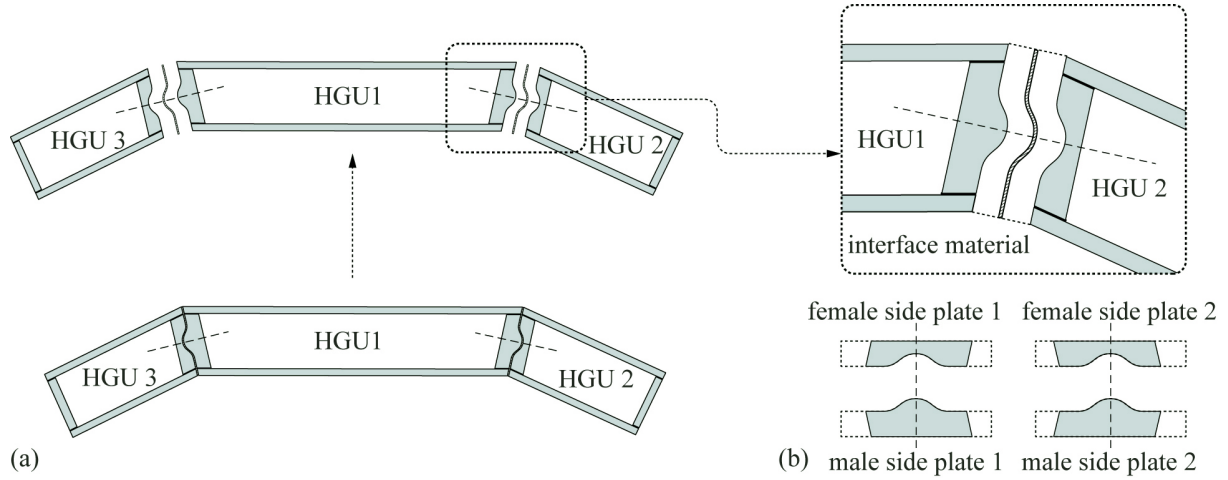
Locking mechanism between adjacent HGUs (a) Bridge cross section, (b) Inter-HGU connection detail.
